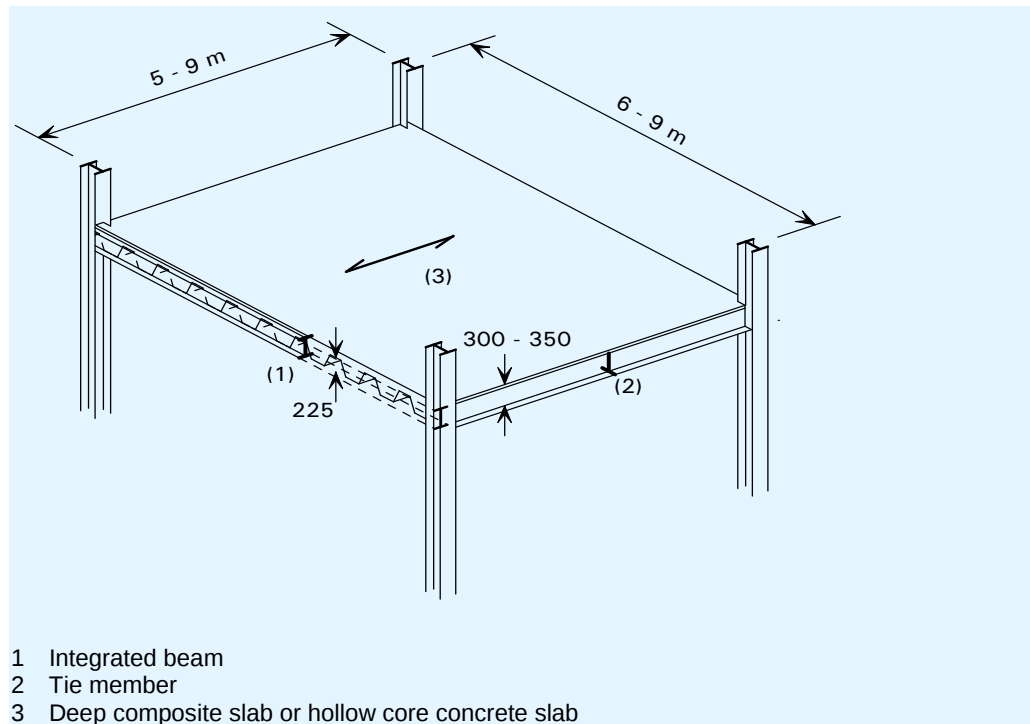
Integrated beams or slim floor (span of slab is indicated)
